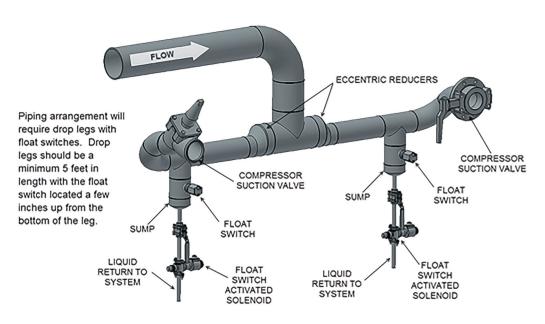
Multiple Compressor Suction Piping (Where Drain Back to Accumulator Is Not Possible)
